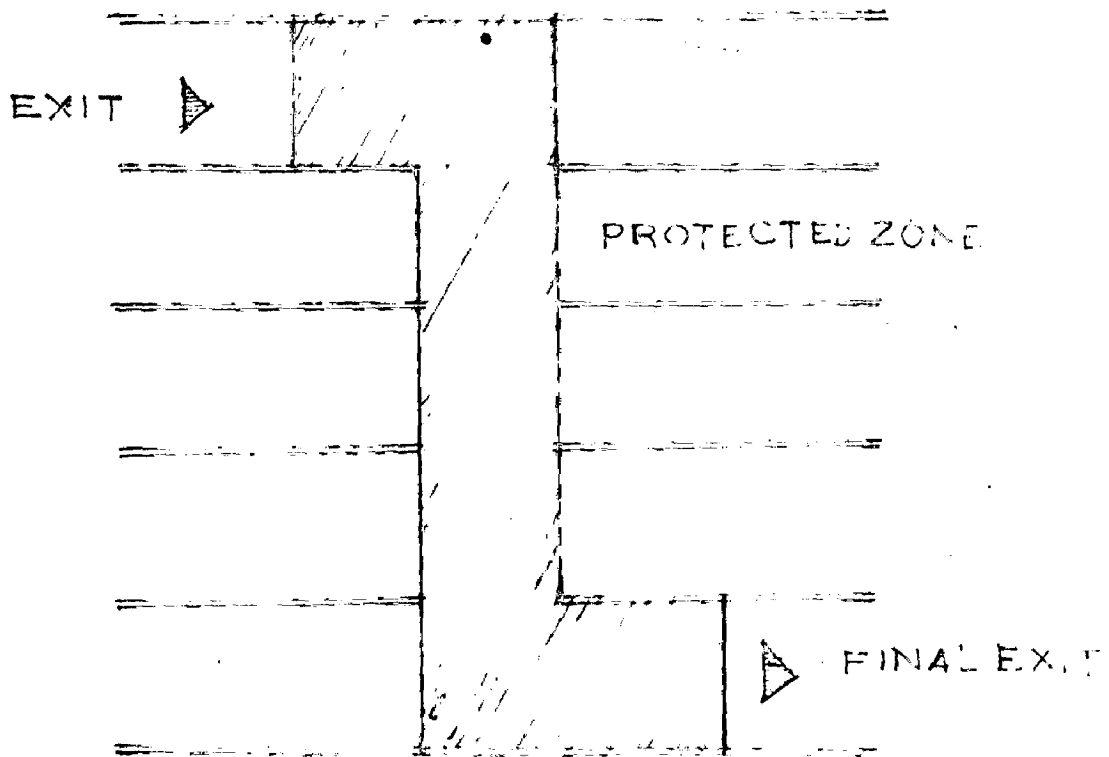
/B STAGES OF ESCAPE MAY BE CONSIDERED PROTECTED ZONE BOTH HORIZONTAL AND VERTICAL
